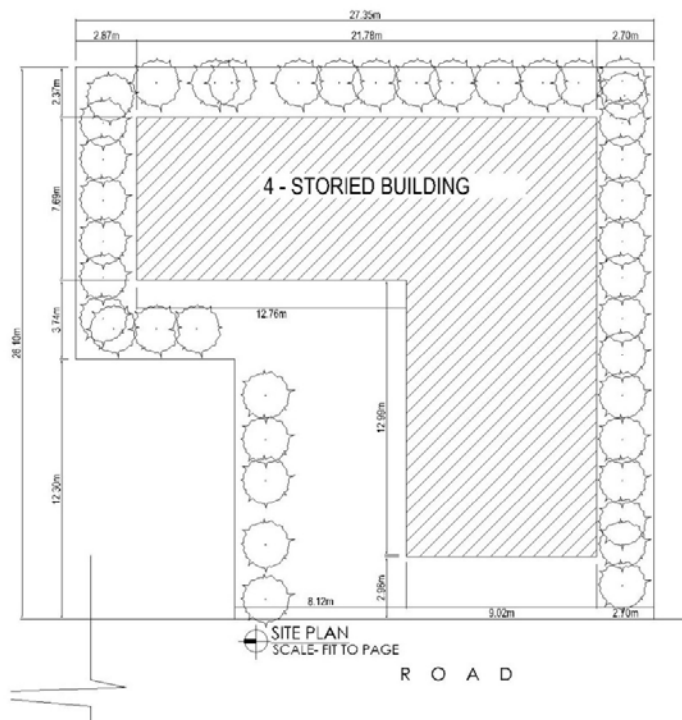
Site plan of AMBERKHANA DARSHANDEURI GOVERNMENT PRIMARY SCHOOL . (Source: author)
